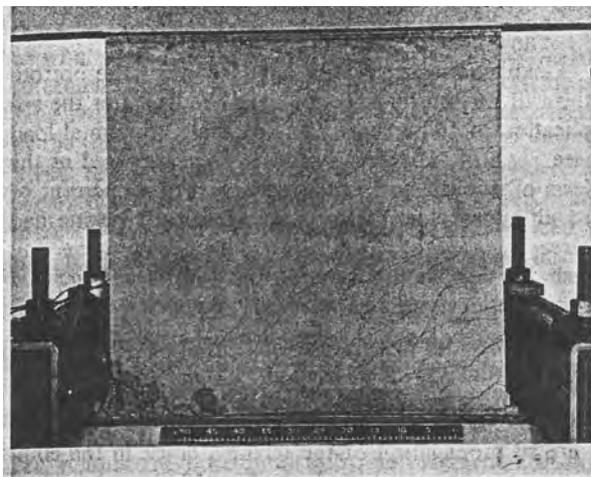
Cracking pattern for wall SW11 tested by Lefas et al. (1990) at compression zone failure
